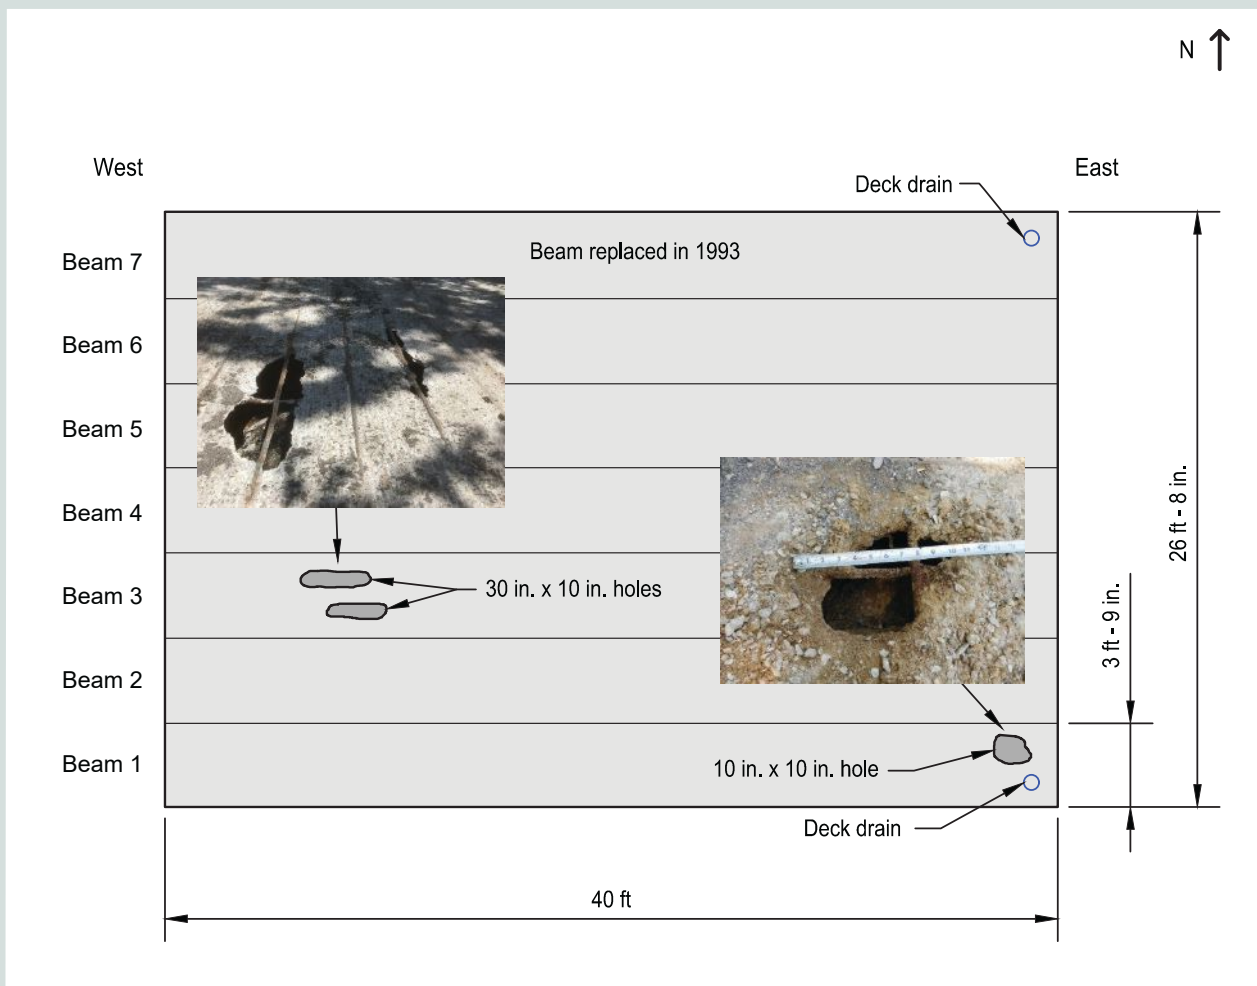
Plan view of the bridge top flange deterioration. Note: 1 in. = 25.4 mm; 1 ft = 0.305 m.
